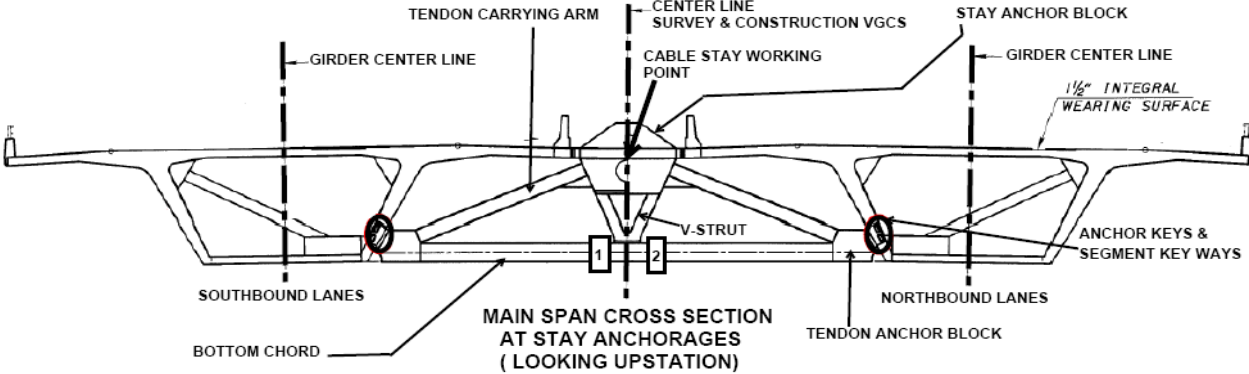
Bridge cross-section at stay anchorage point. Delta frame and two box segments
